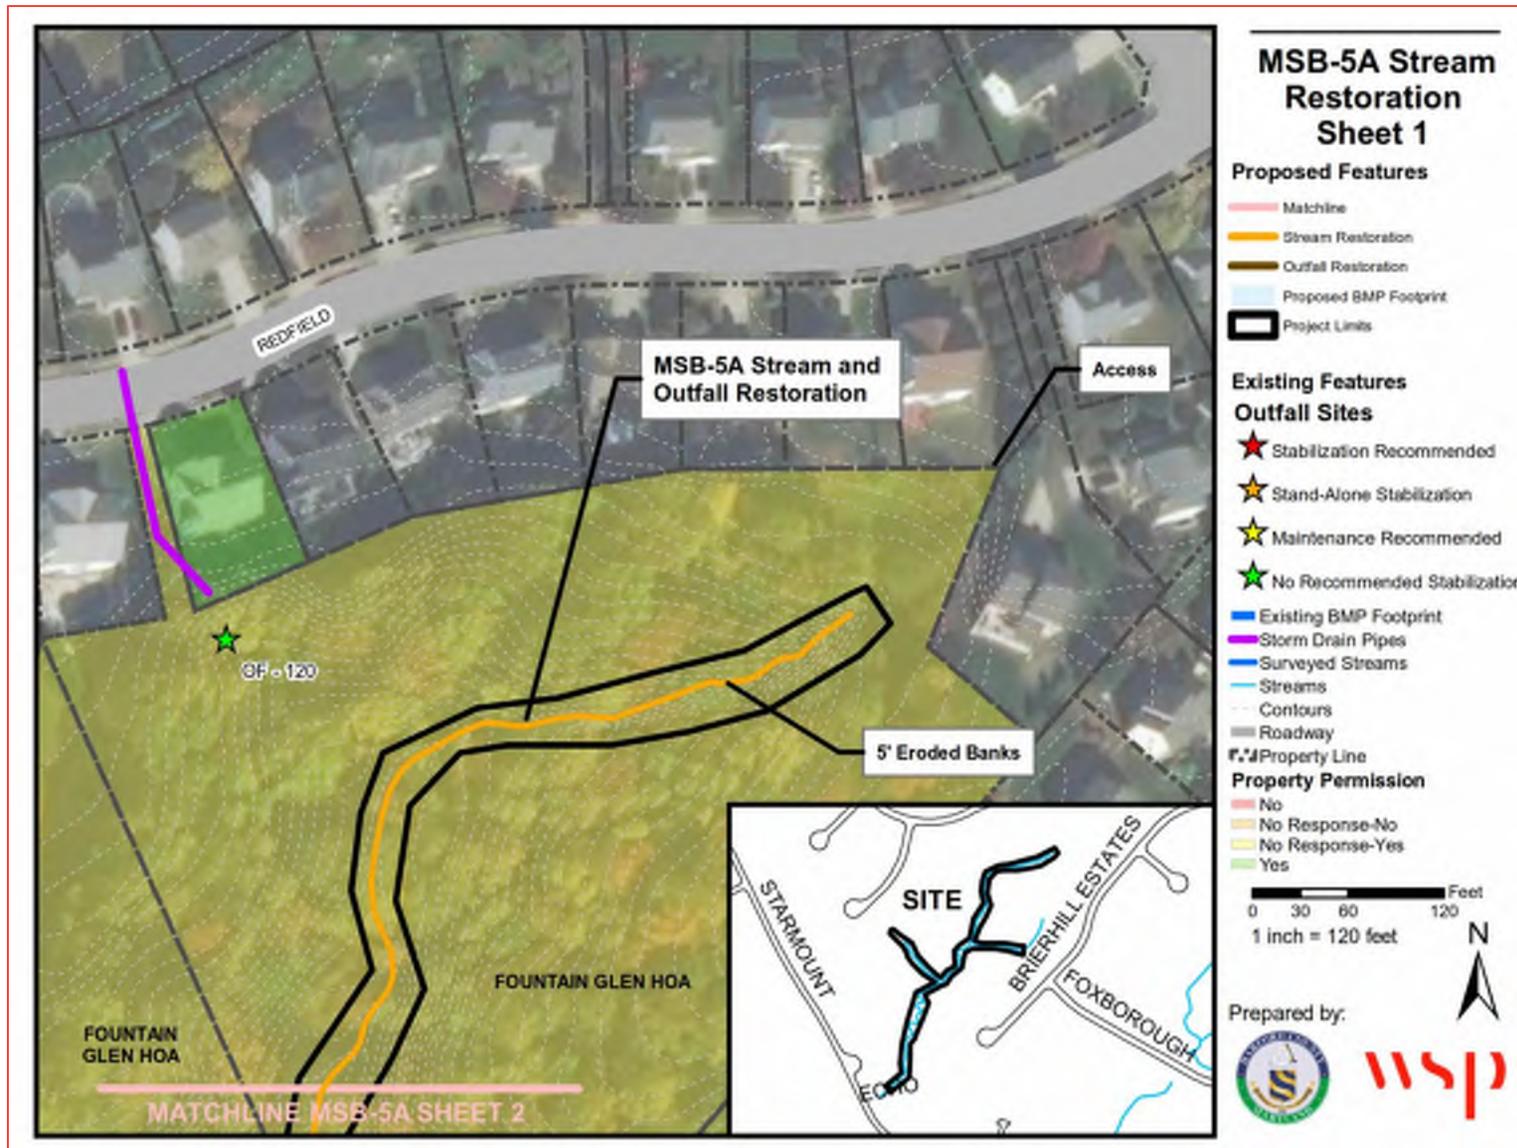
Site Location and Proposed Project Plan for MSB-5A Stream and Outfall Restoration (Sheet 1 of 3)
